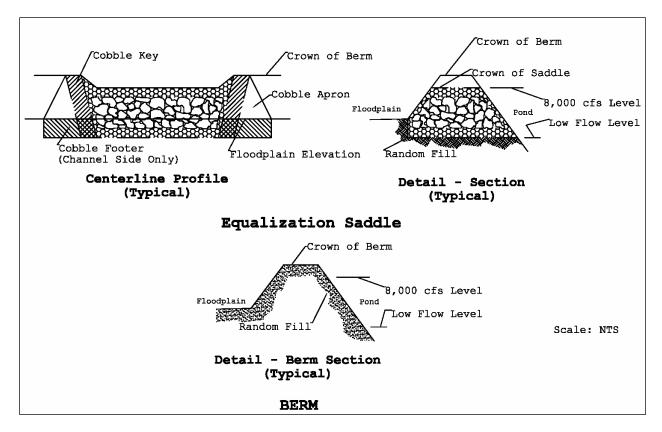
Typical Sections of Equalization Saddle and Berm Design
